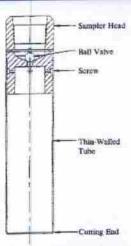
Schematic of Thin-Walled Shelby Tube (After ASTM D 4700).
